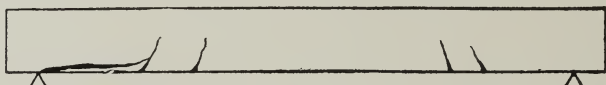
Failure of Reinforced Concrete Beam by Splitting of Concrete.
